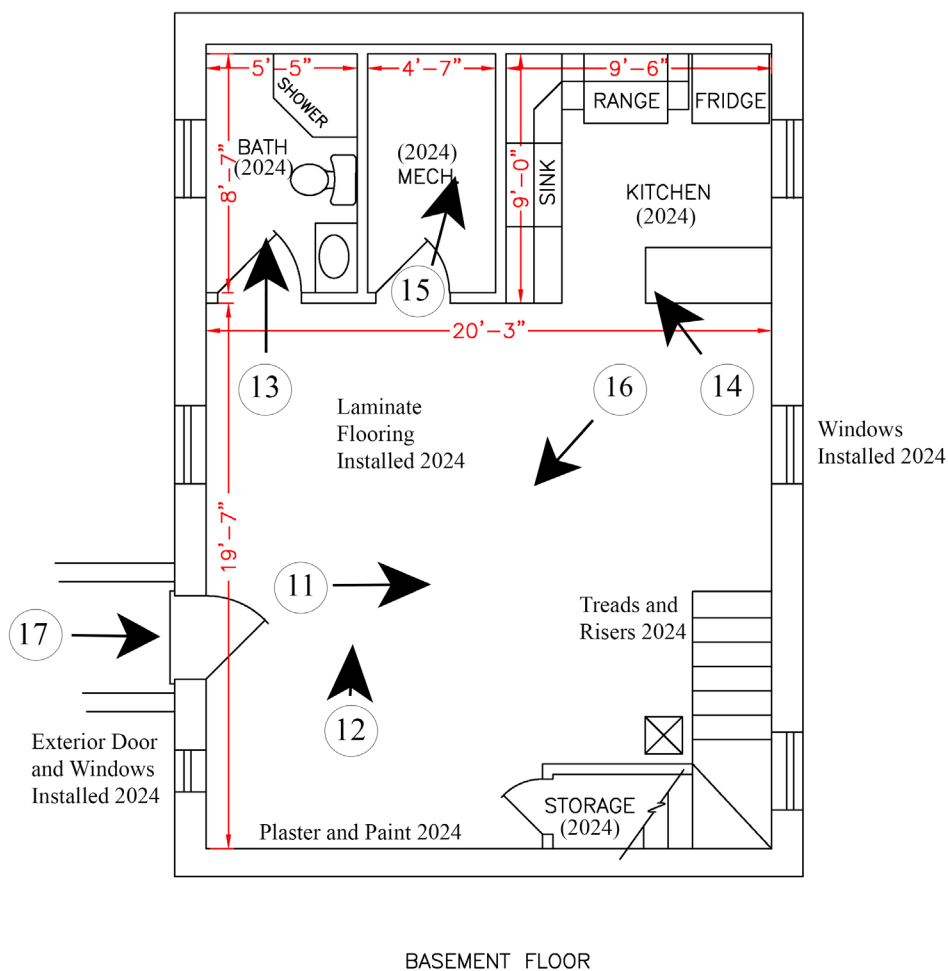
Current Floor Plan (Basement Level). C.W. Oaks III.
